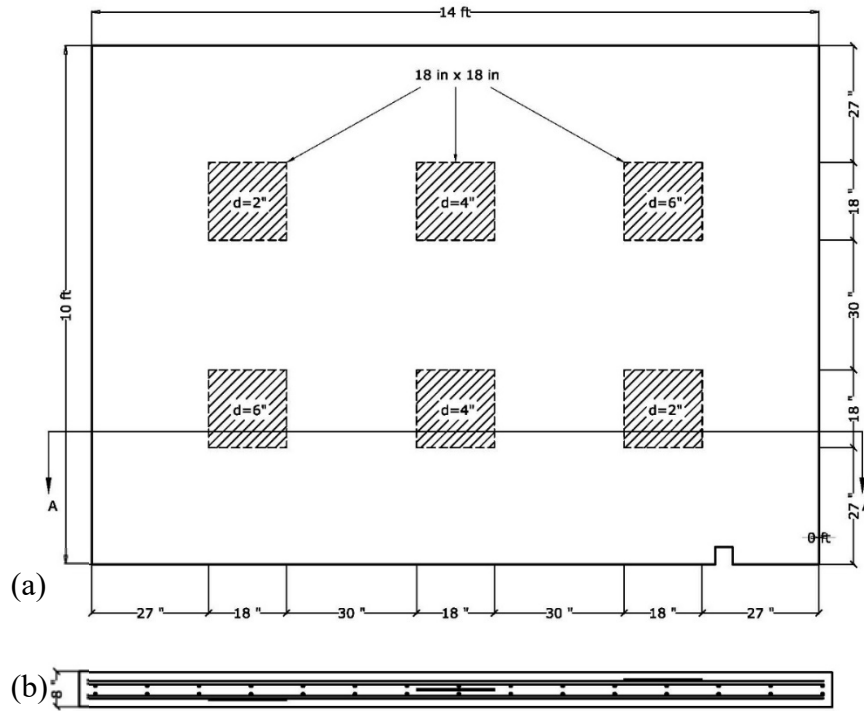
Plan view of concrete slab: a) showing the locations and dimensions of delamination embedded in the specimen, b) A cross section A-A showing the defect locations within the depth.
